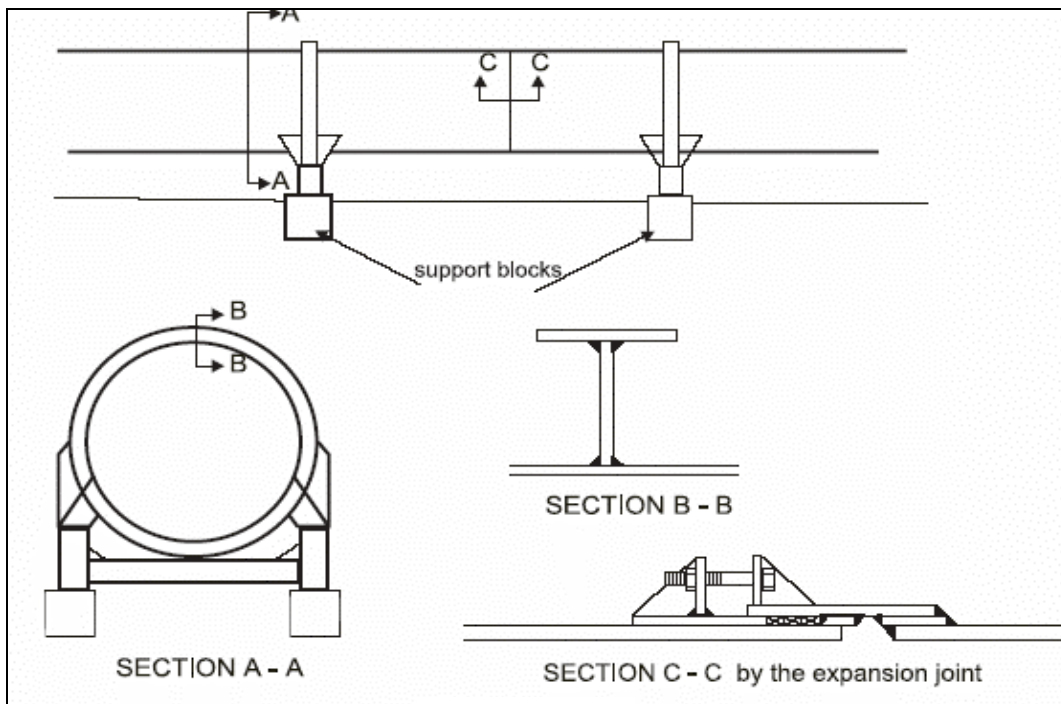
Penstock with concrete anchor blocks and expansion joints
